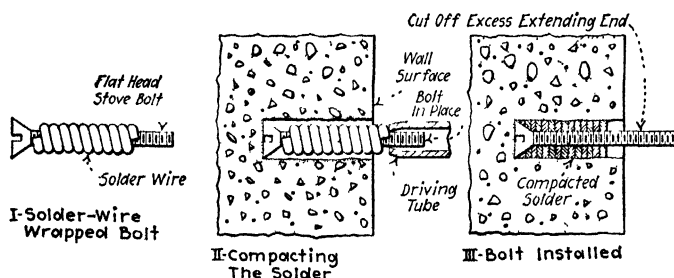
Method of holding an attachment bolt with a solder-wire anchor.
